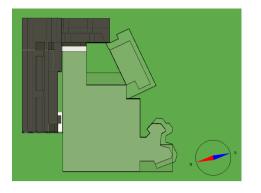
Original building model, Eki Karjalainen / Ramboll.
